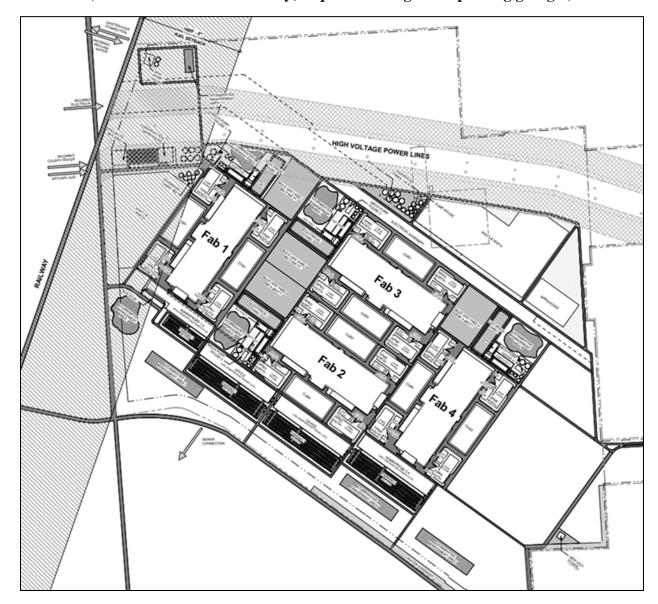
Site Layout Alternative 7 (Fabs 2-3 rotated horizontally; requires underground parking garages)
